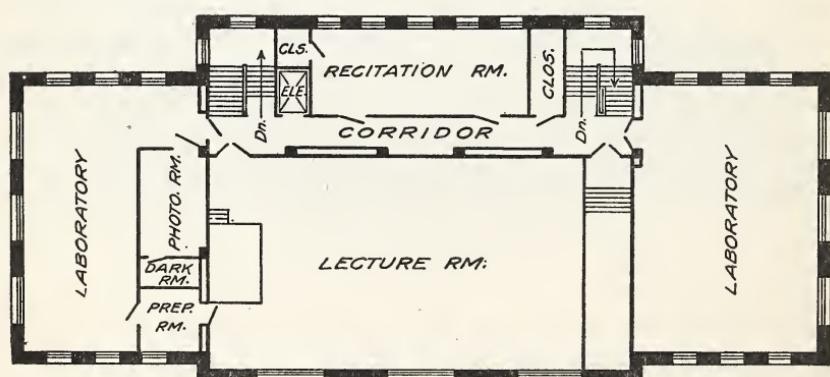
Third-floor plan, poultry husbandry building, Cornell University.
